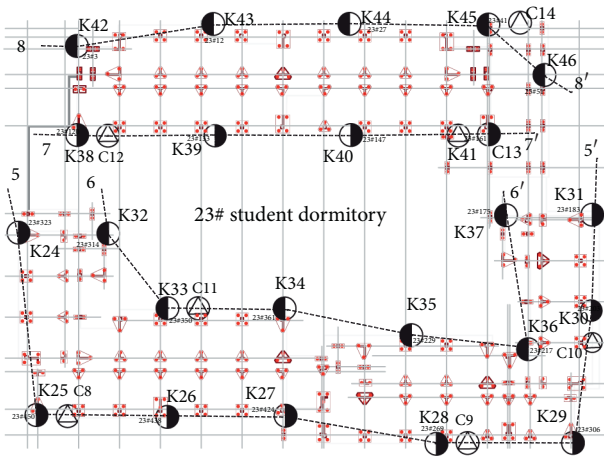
The investigation site with pile location layout of 23# student dormitory.
